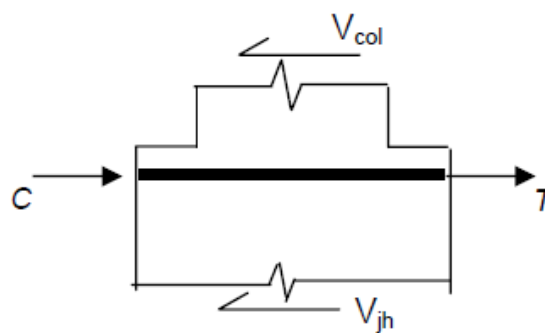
Detail of forces acting at the interior beam-column joints.
